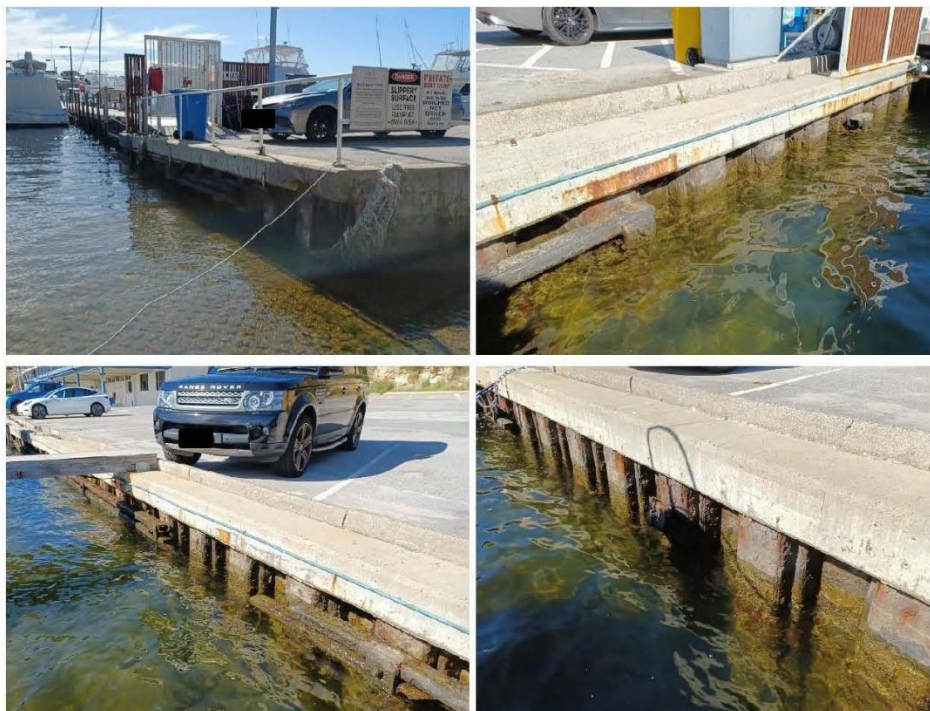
Sheet Pile Wall with Concrete Pile Cap
